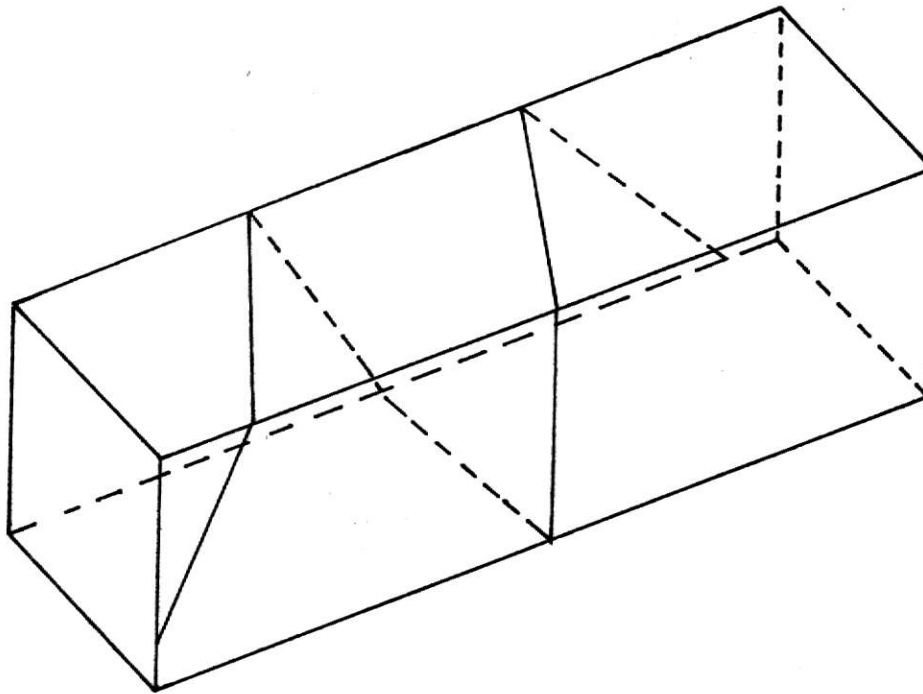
Helical Cracks of Plain Concrete Section under Pure Torsion
